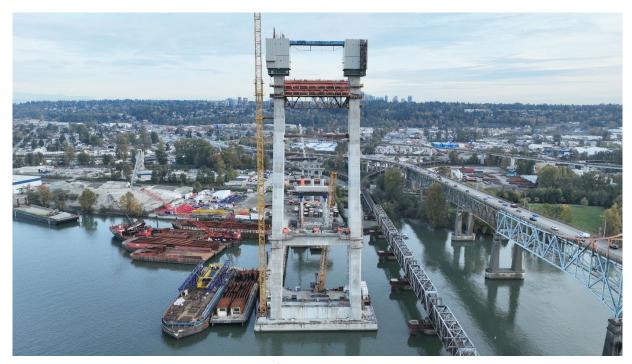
Aerial Of Ongoing Pier S1 Tower Construction
